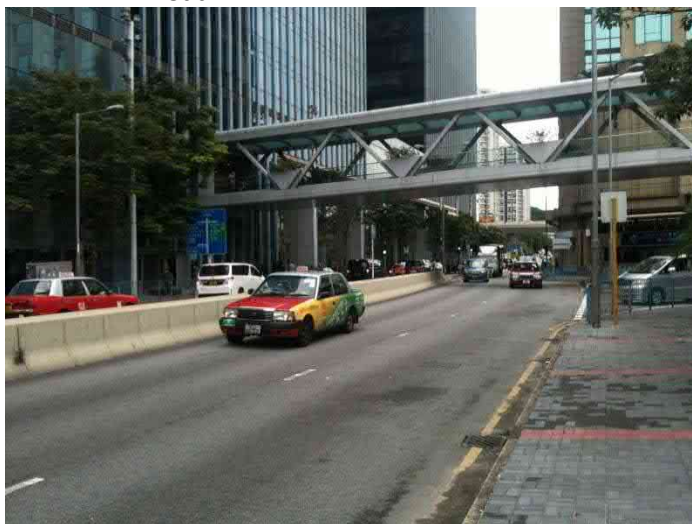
Existing Footbridge Across Wai Yip Street Connecting Manulife Financial Centre and Kwun Tong Ferry Pier
